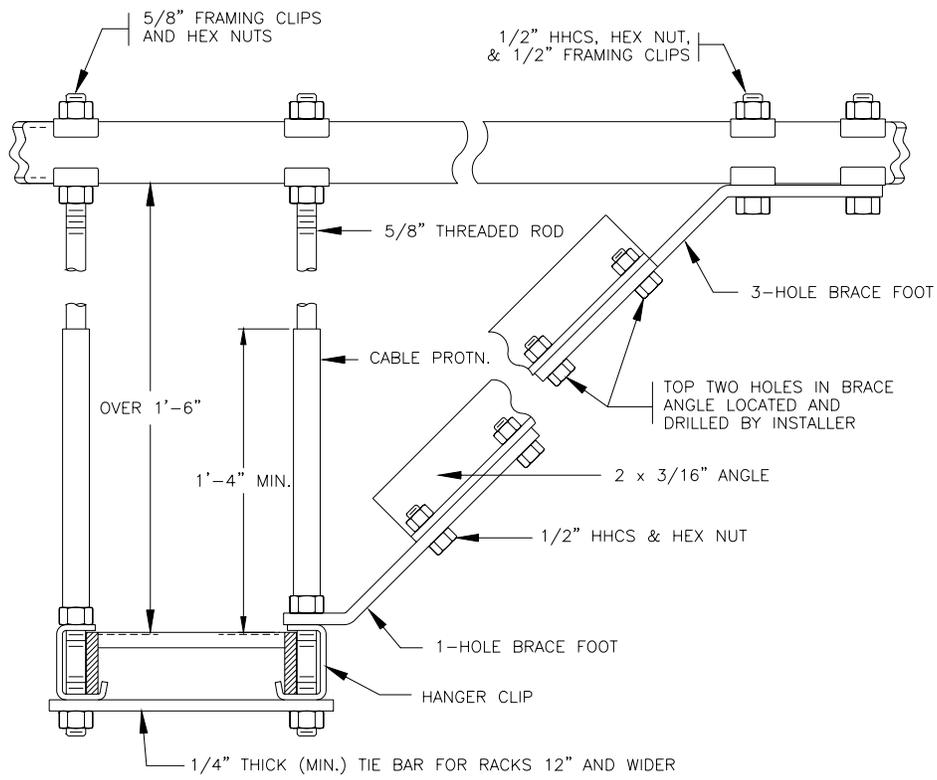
Standard Cable Rack Support And Bracing – Racks Not Attached Directly To Auxiliary Framing
